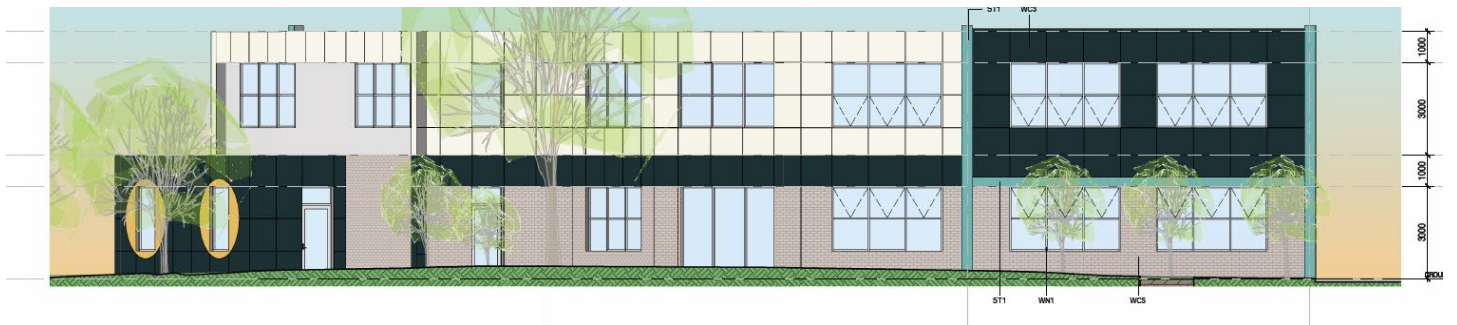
Extract of the south elevation of South Block (when viewed from Cobram Avenue)
